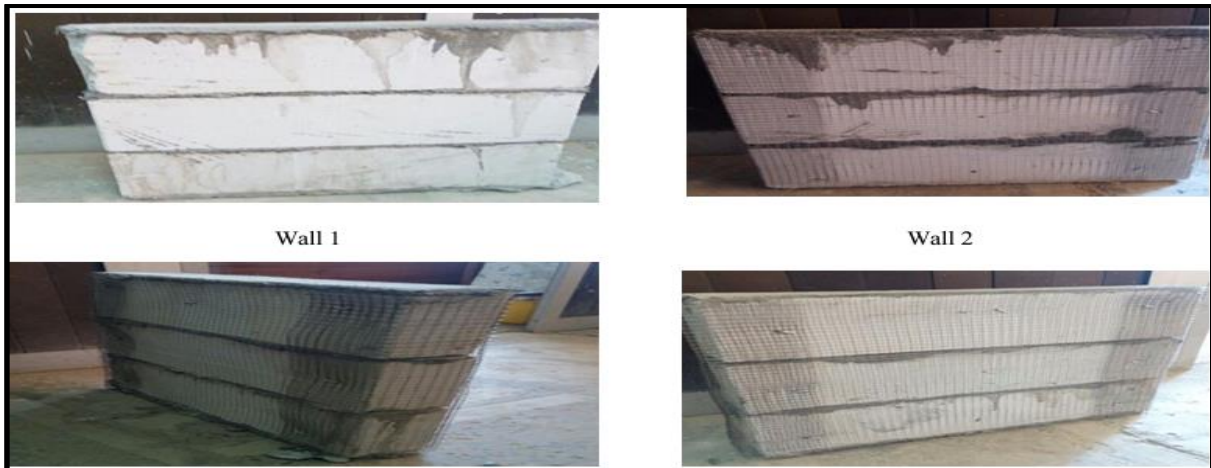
Wall construction from ferrocement panels (Rifaie et al., 2014)
